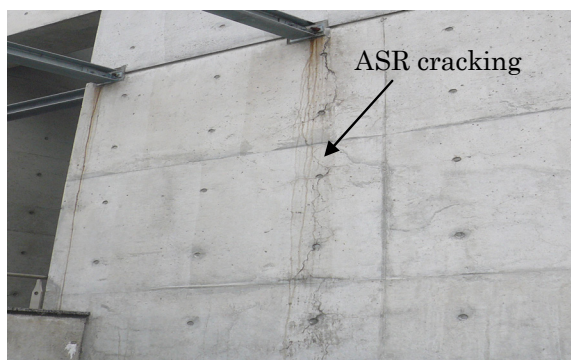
Recent case of ASR cracking on wall of RC building.
